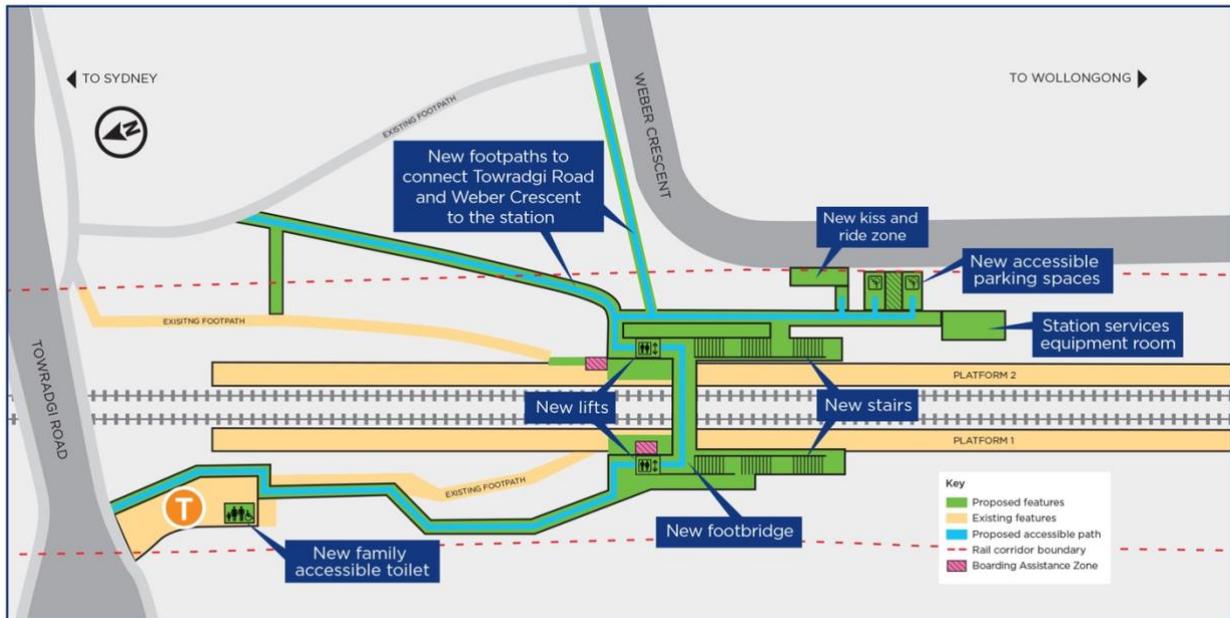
Proposed Towradgi Station Upgrade (indicative only, subject to detailed design)
